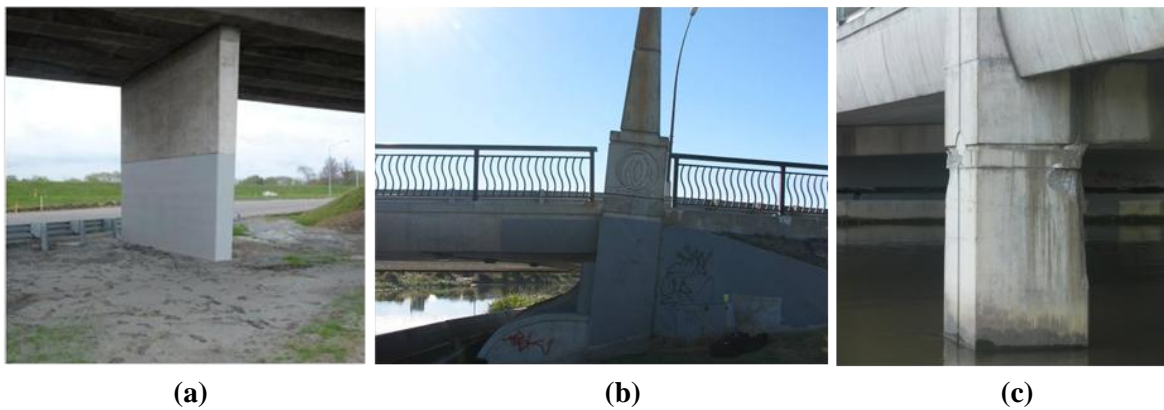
a) Liquefaction around the piers of Channeys Pass Road Bridge [Photo by M. Anagnostopoulou]; b) Backwards rotation of the abutments of Anzac Drive Bridge [Photo by A. Palermo]; c) Plastic hinging at the pier caps of Anzac Drive Bridge [Photo by E. Camnasio].
